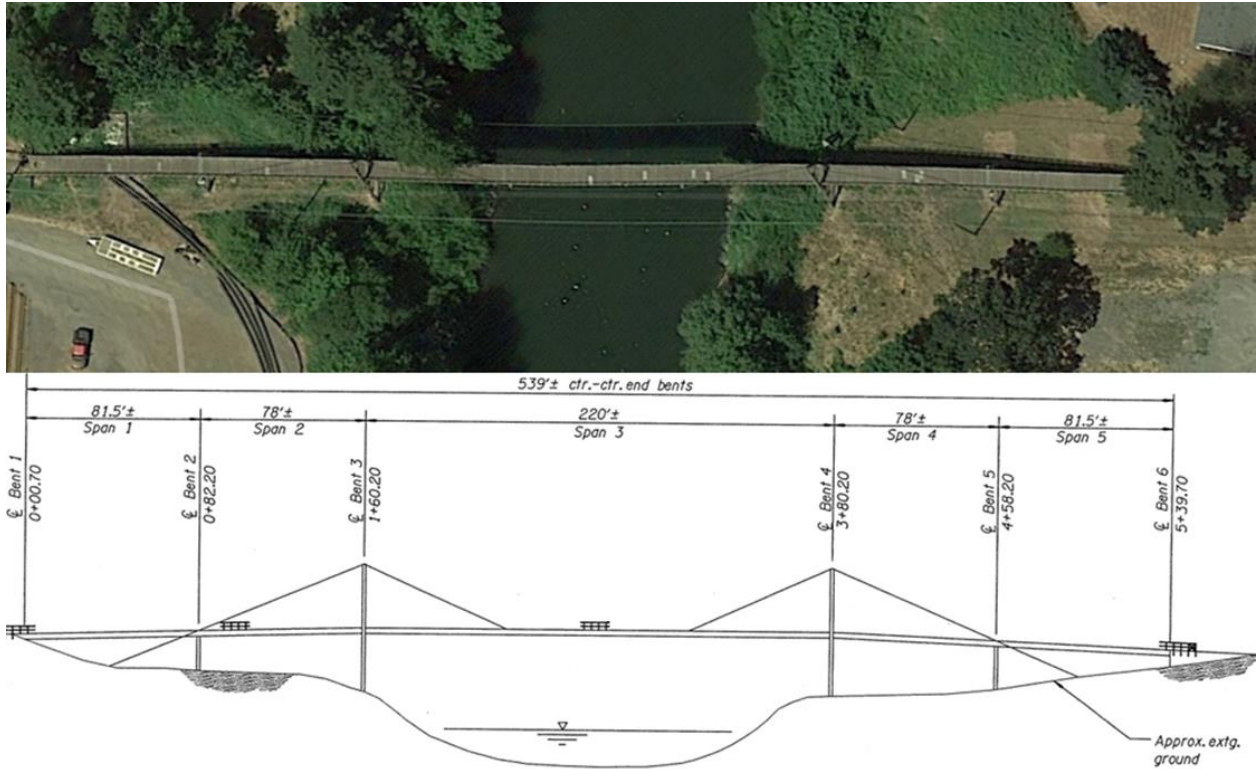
Ferry Street pedestrian bridge over Yamhill River
